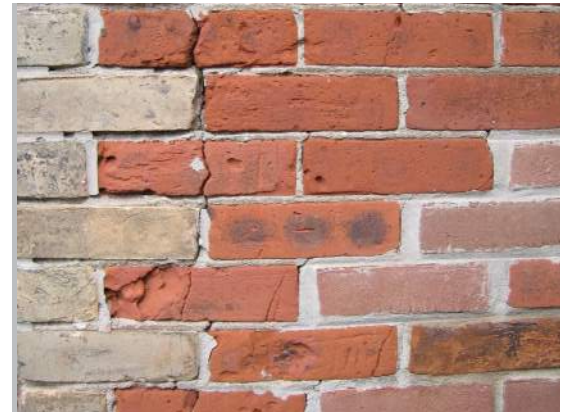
Britannia Farmhouse. Brick deterioration. 2009
